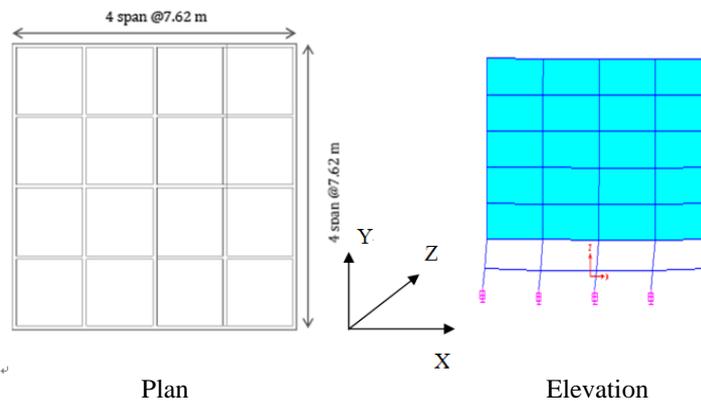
Plan and elevation of the isolated-based building with soft bottom story
